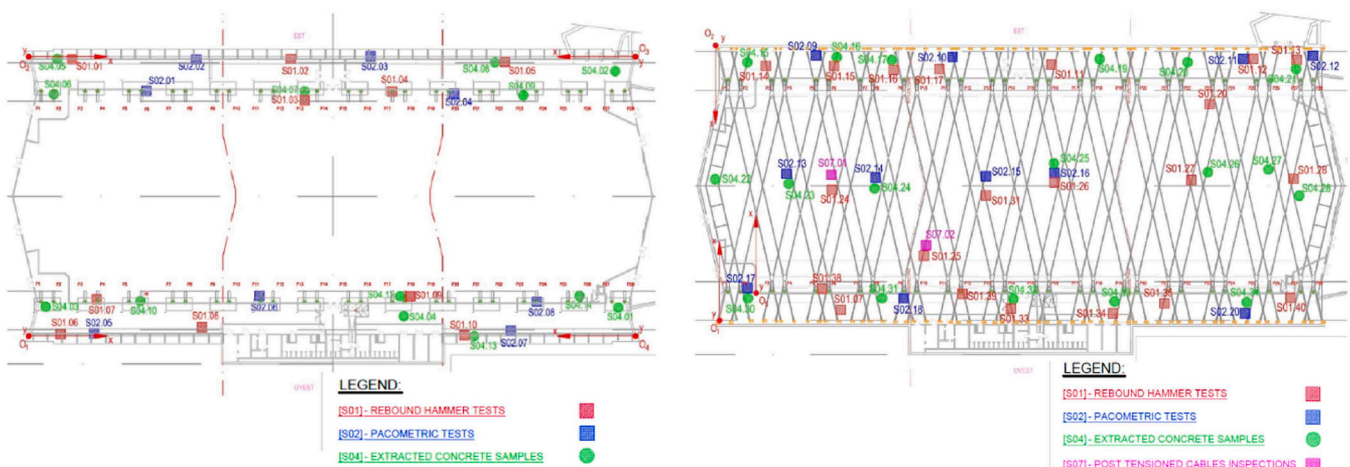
Pavilion V: positions of the test setup at the underground floor (left) and at the roof level (right) [42].
